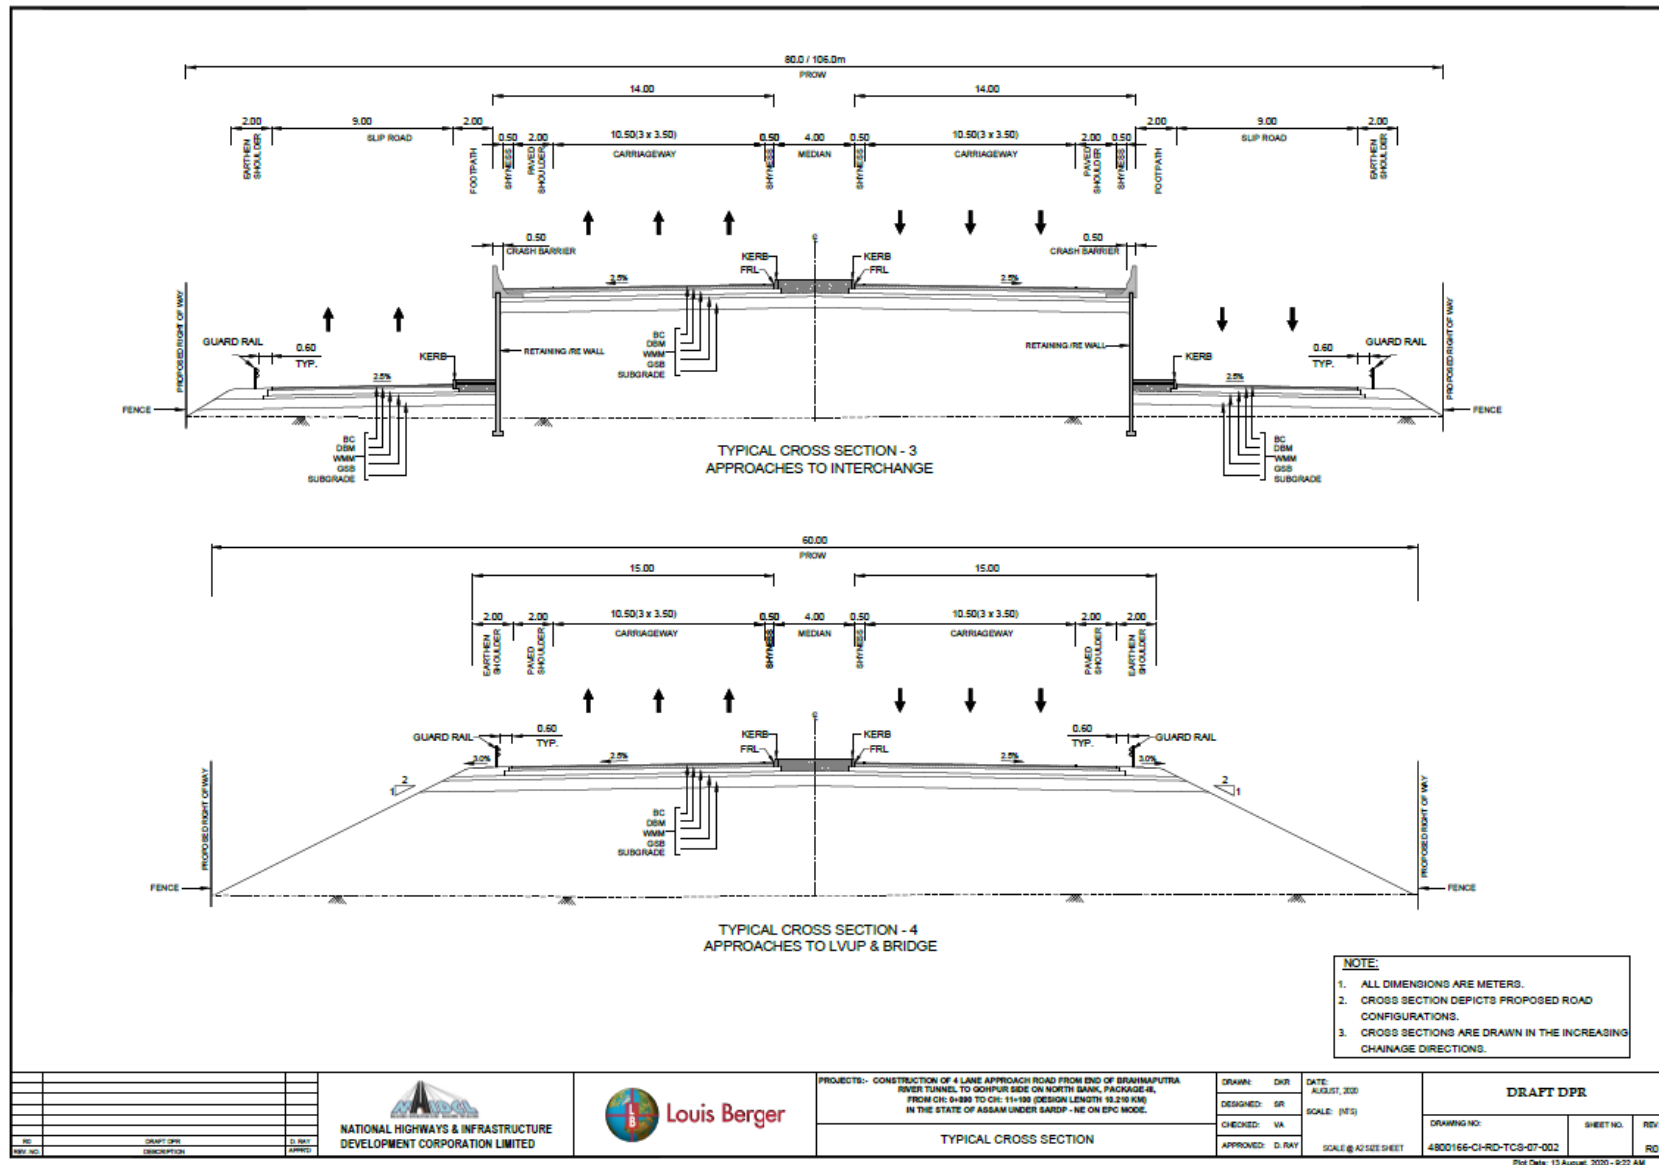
Typical Cross-section-Approaches to Interchange and Approaches to LVUP & Bridge
